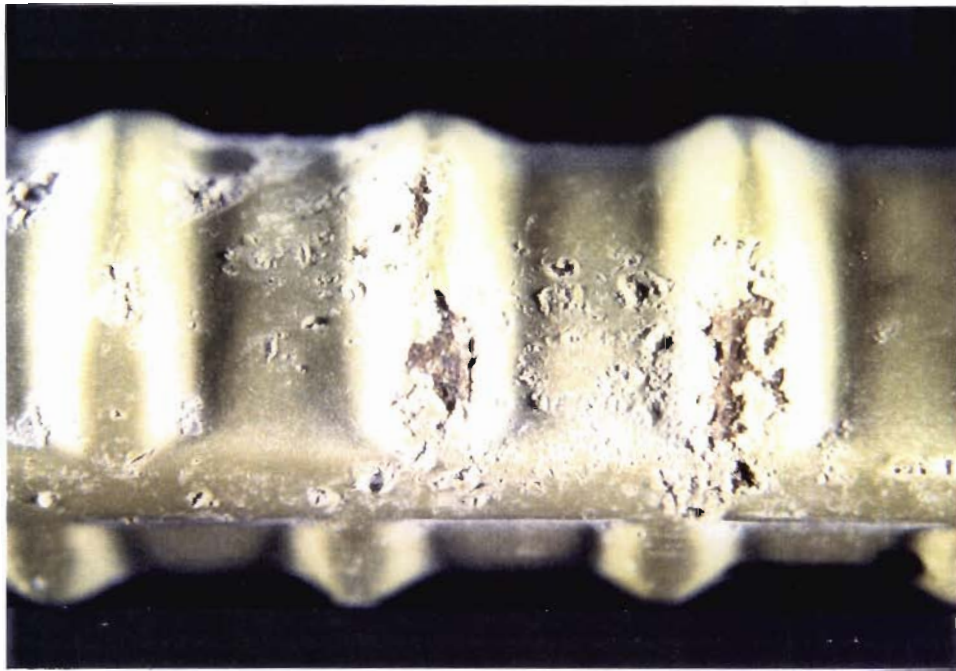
Damage due to vibration on #4 bars – slab specimen.
